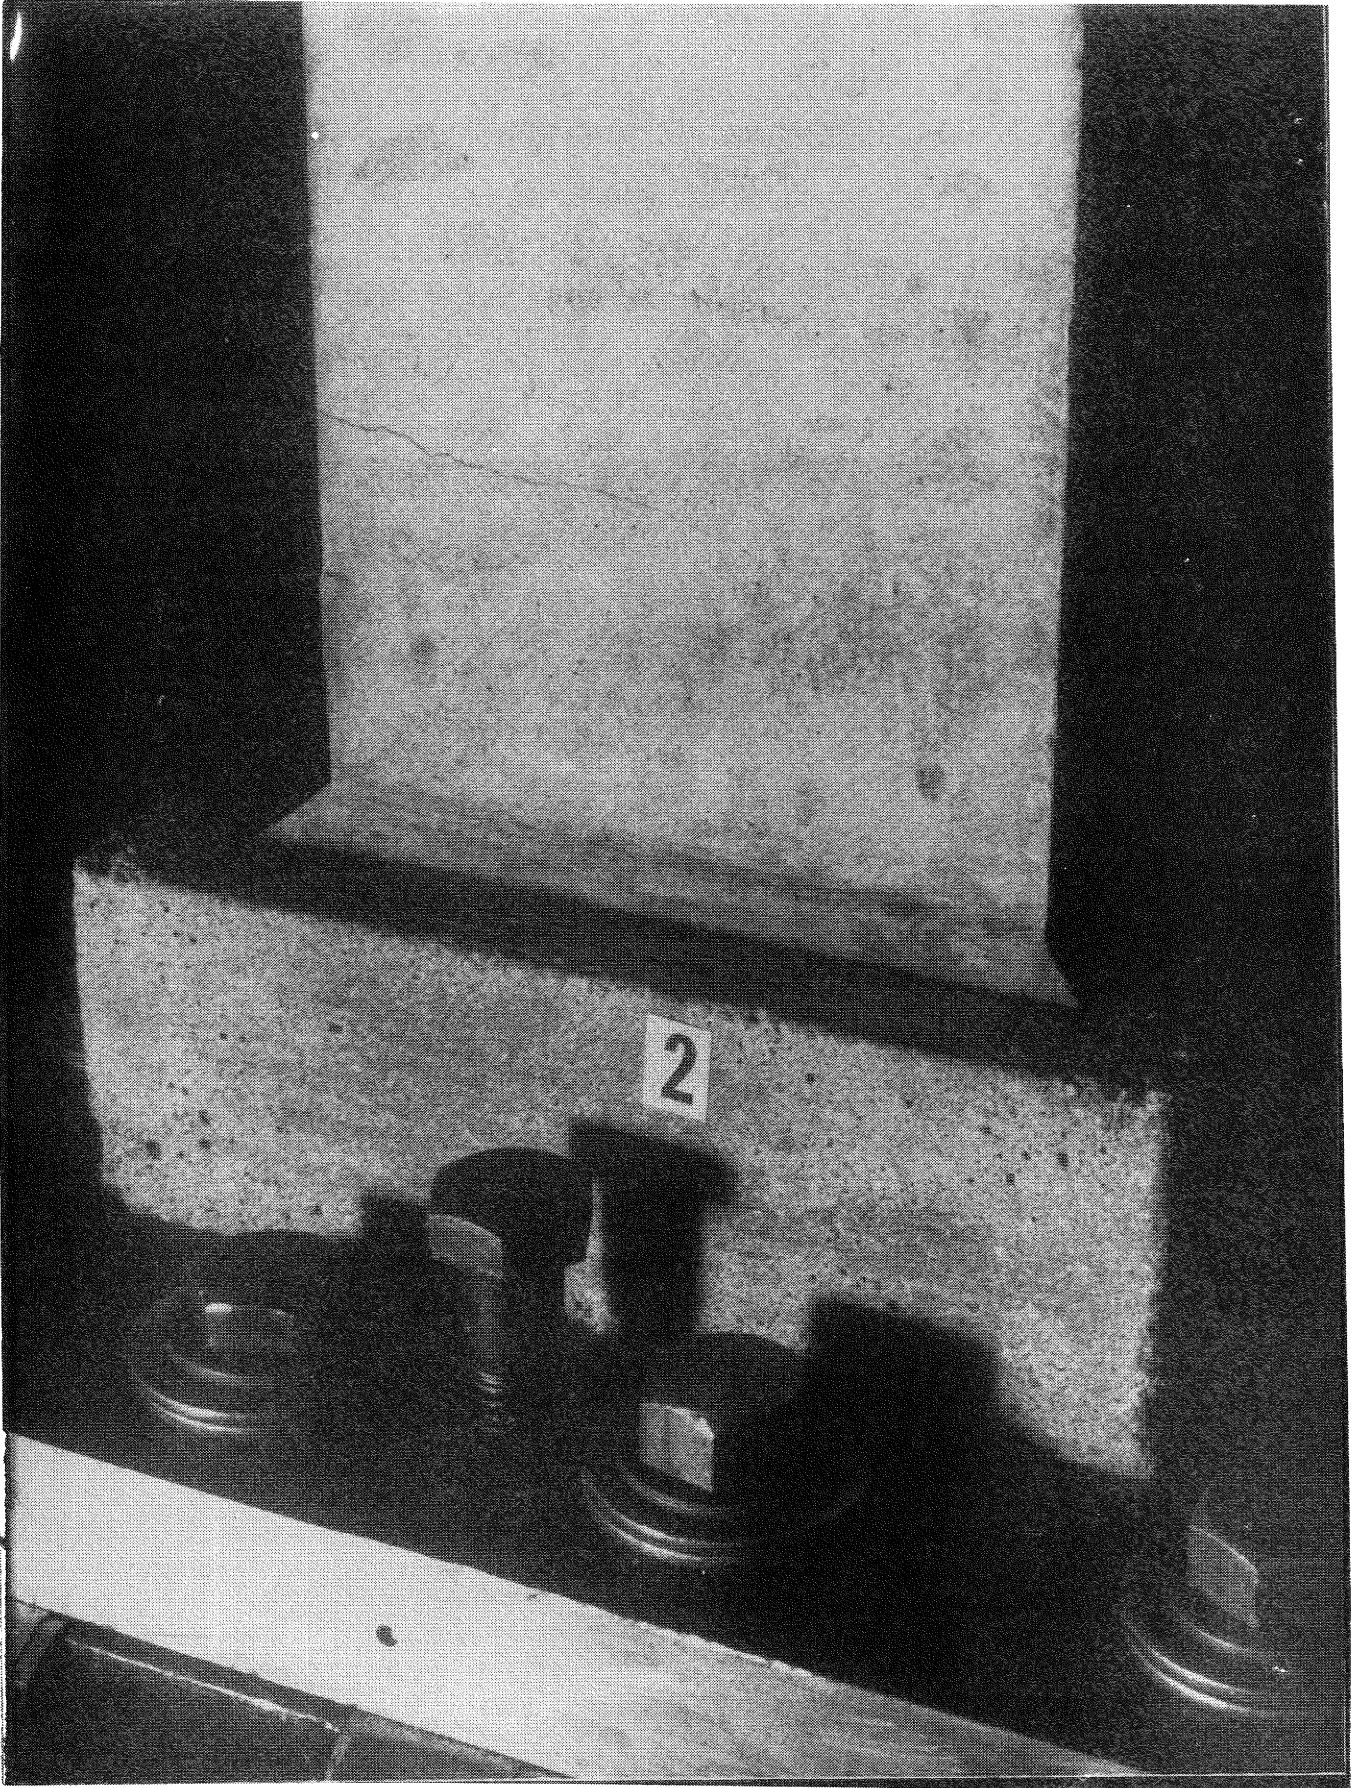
CENTRAL COLUMN DAMAGE, TEXT Y5A.
